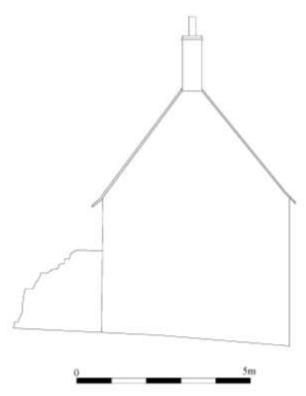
West-facing elevation (without lean-to extension) Modified from client's plans
